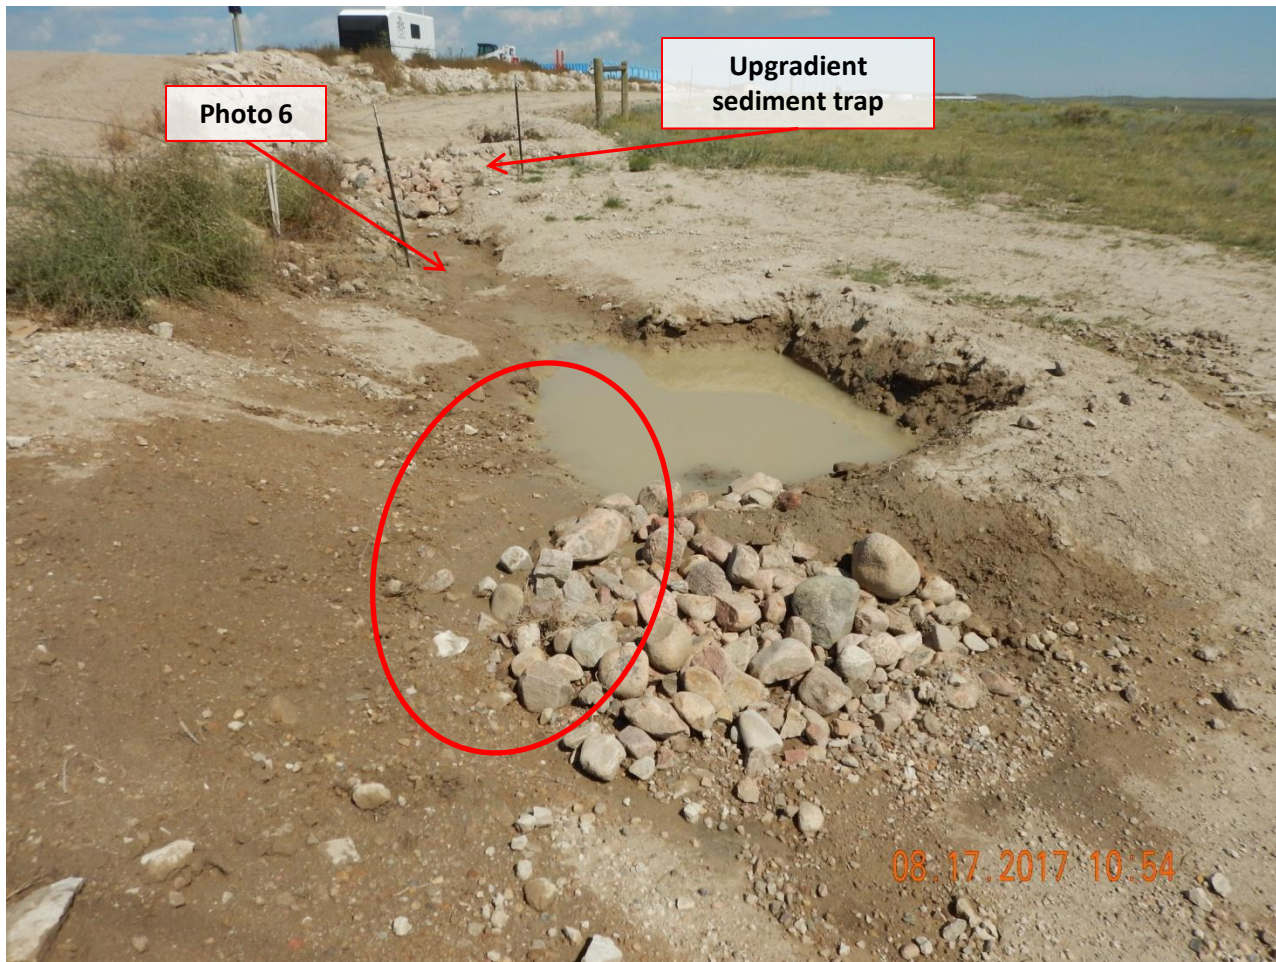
Photo taken from the previously mentioned upgradient sediment trap, facing West. Appears the Operator has enlarged the sediment trap size with a stabilized outlet area. Embankment material and embankment construction does not appear to be sufficient compacted, as it appears unconsolidated material could be contributing to sediment loss. Appears the Operator has re-installed surface roughening along the southern perimeter of the location. Refer to Photo 4 for a picture taken of the sediment trap from the July 11, 2017 inspection.
